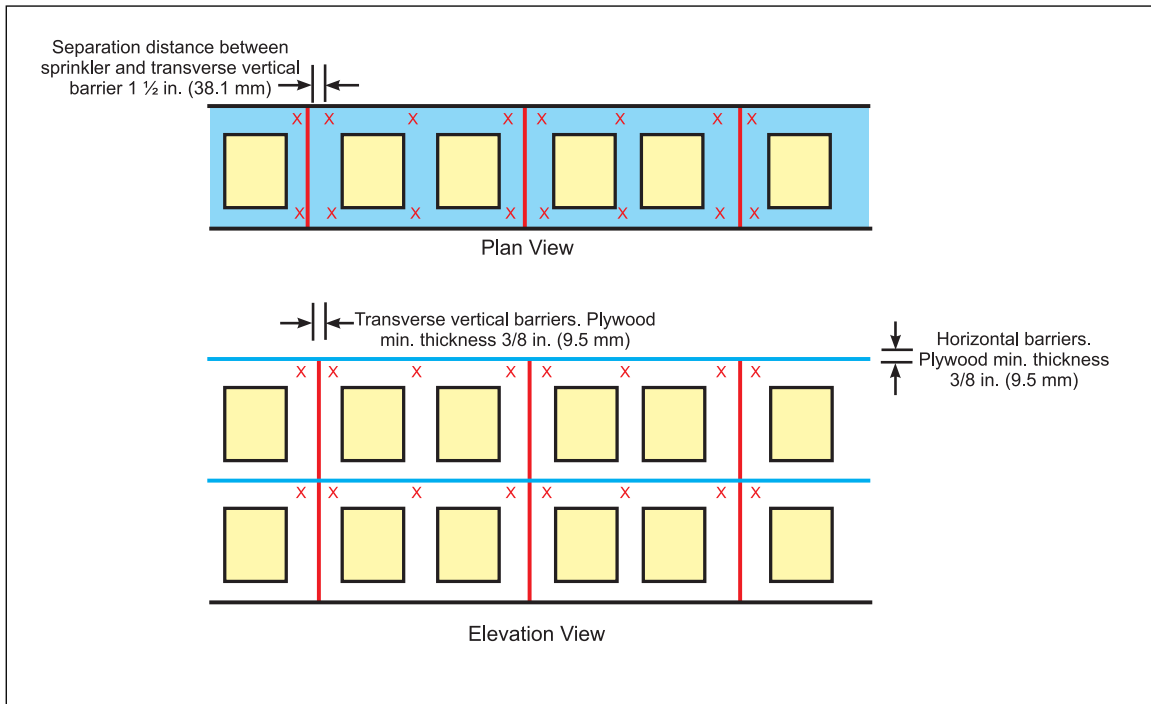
In-rack sprinkler arrangement for single-row racks (Class 3)
